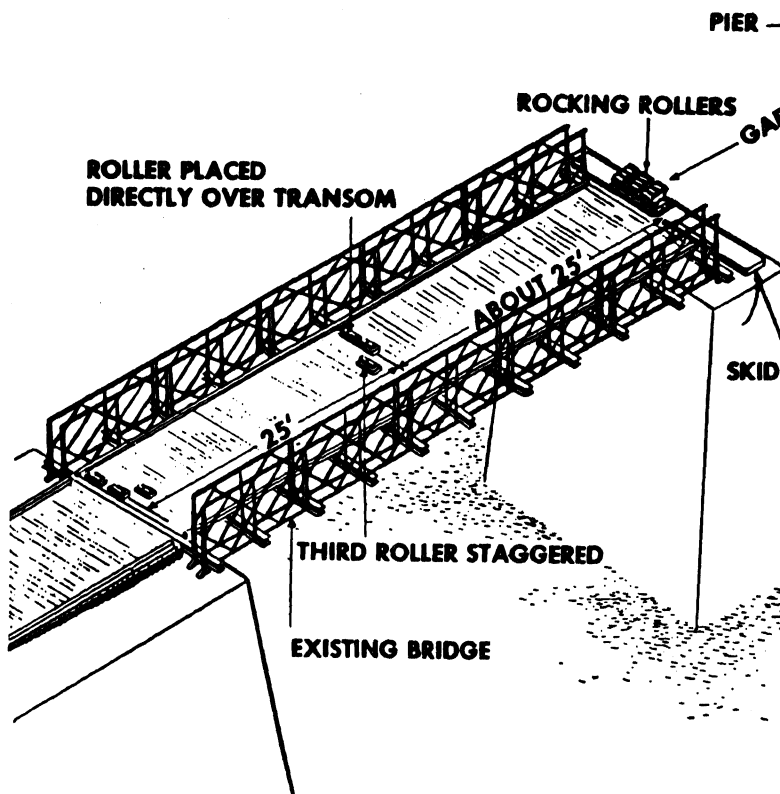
Layout of launching rollers for launching triple-truss (3'-0") girder from
